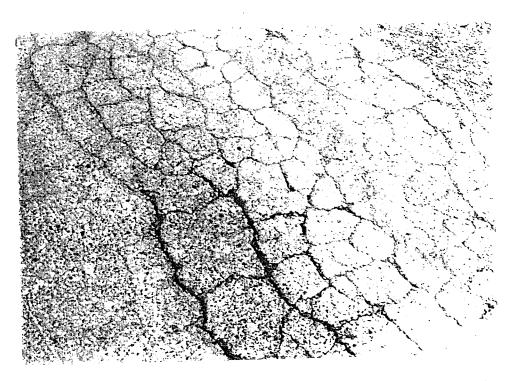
"Before and After" - Cracks Cleaned with Compressed Air
